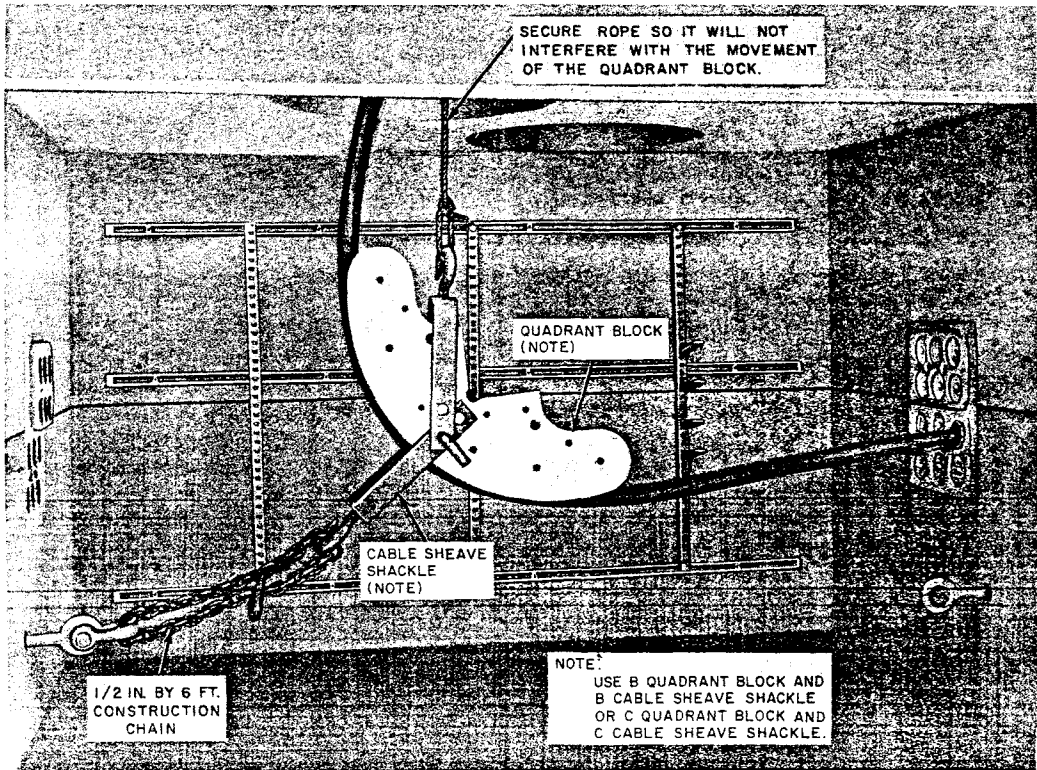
Pulling Arrangement Using Quadrant Block and Cable Sheave Shackle
